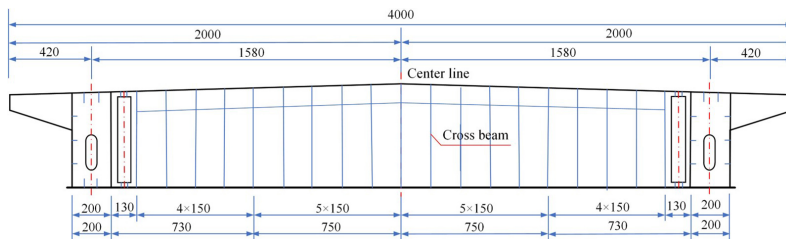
Cross-sectional view of stiffening girder (unit: cm)
